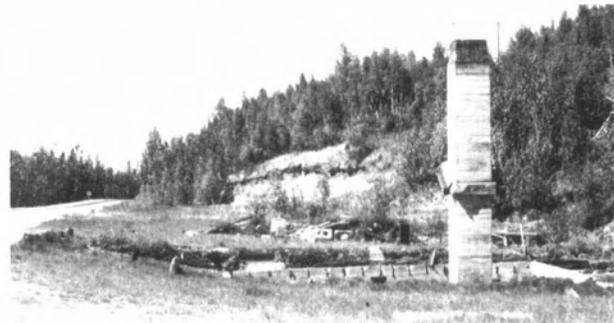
In 1964 the roadhouse was razed, exposing the differentially subsided concrete basement walls. Photograph PK 8631 by T.L. Péwé, June 17, 1964.
